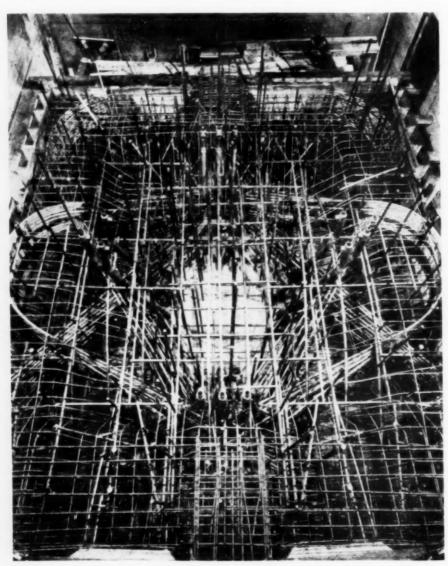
Prestressing Cables in Lower Inertia Block. Note Tops of Grouting Tubes.
